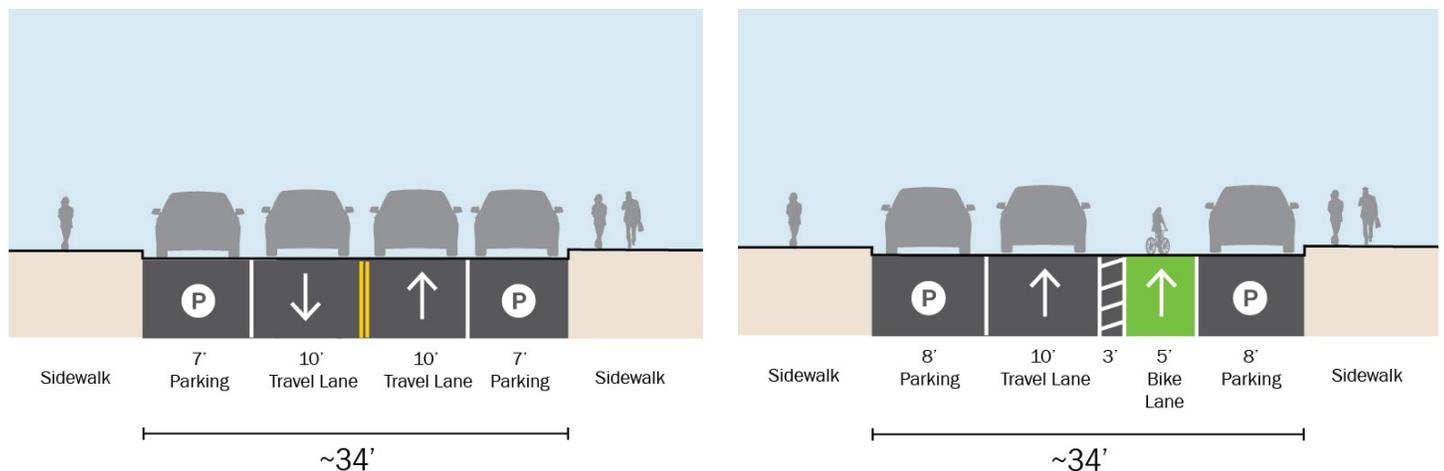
Existing and Recommended Cross Section of Jefferson Street (looking south)
